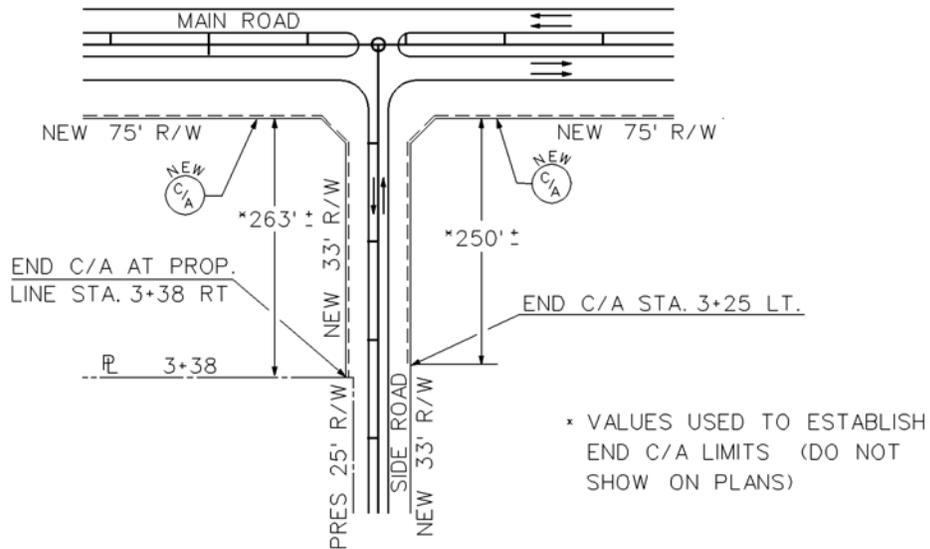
H CONTROL OF ACCESS AT INTERSECTION ROADS
